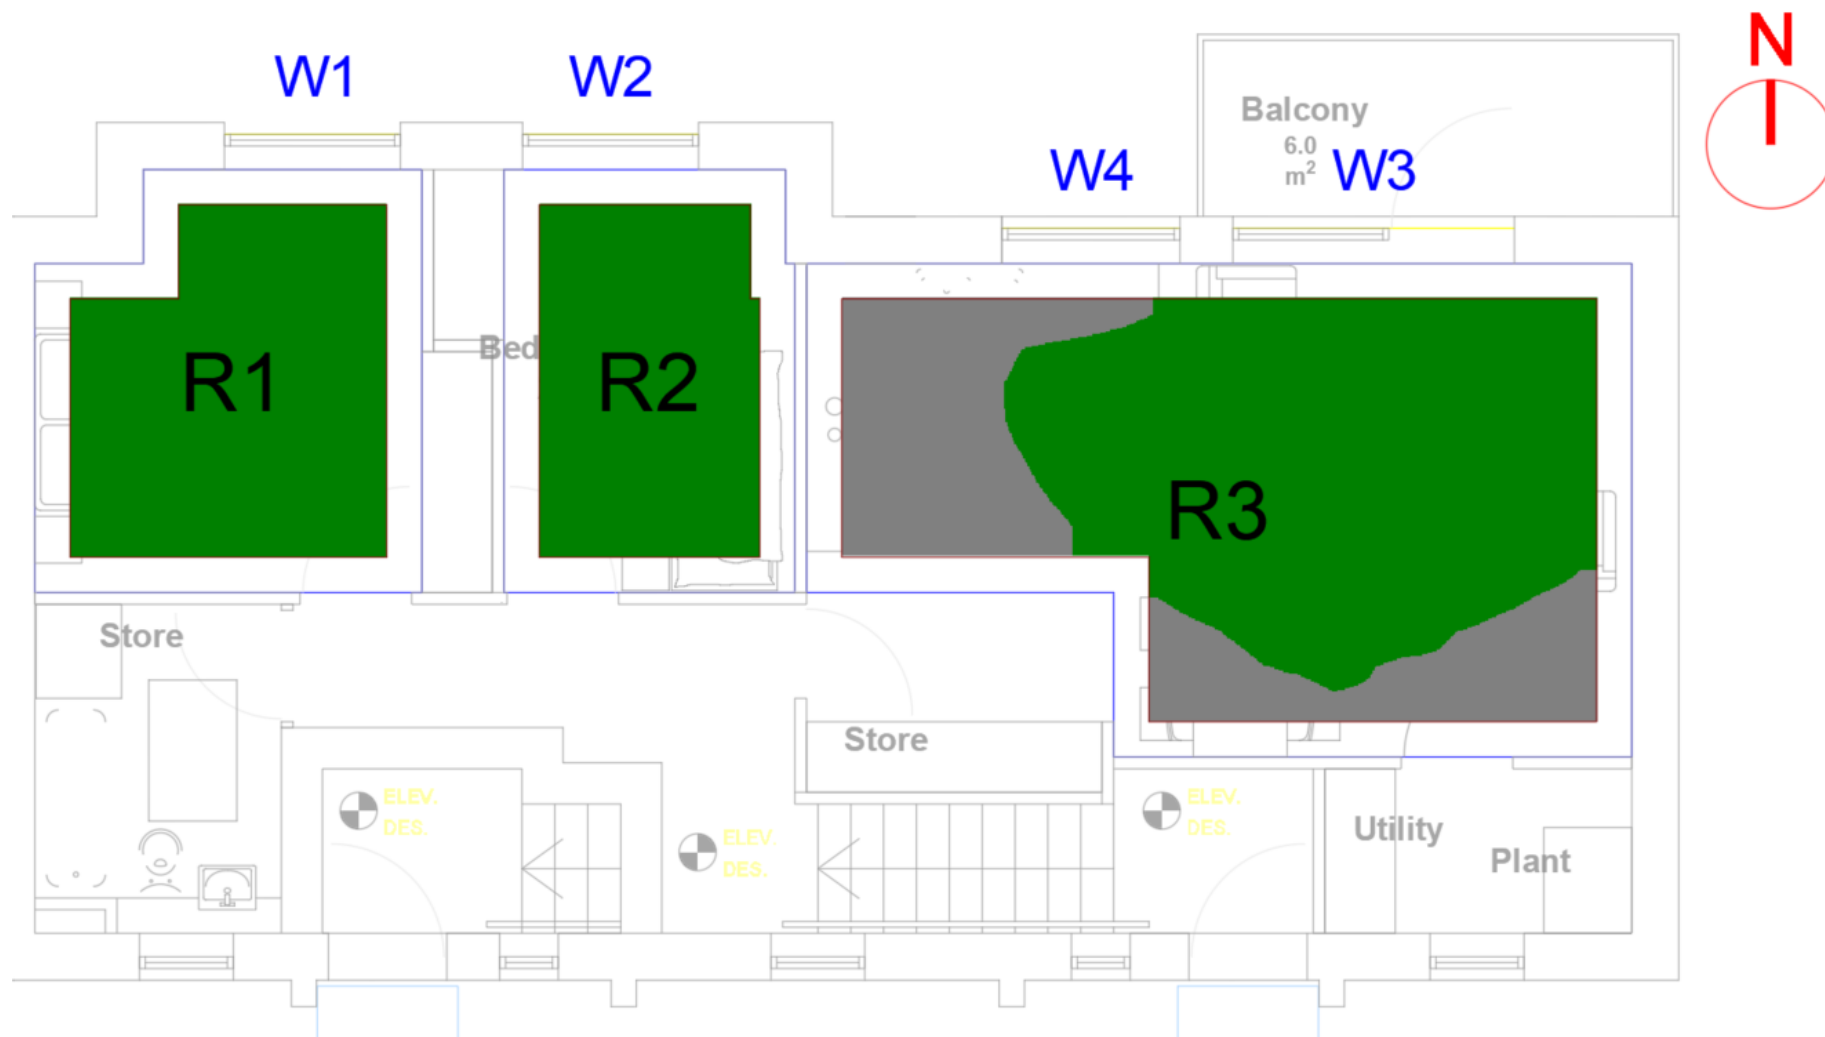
Proposed First Floor sDA Contours of House No.2 Block C (Duplex)
